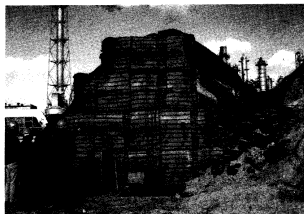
Vertical front-face stretch-made polymer grid (SR) reinforced embankment (for testing in 1986)
